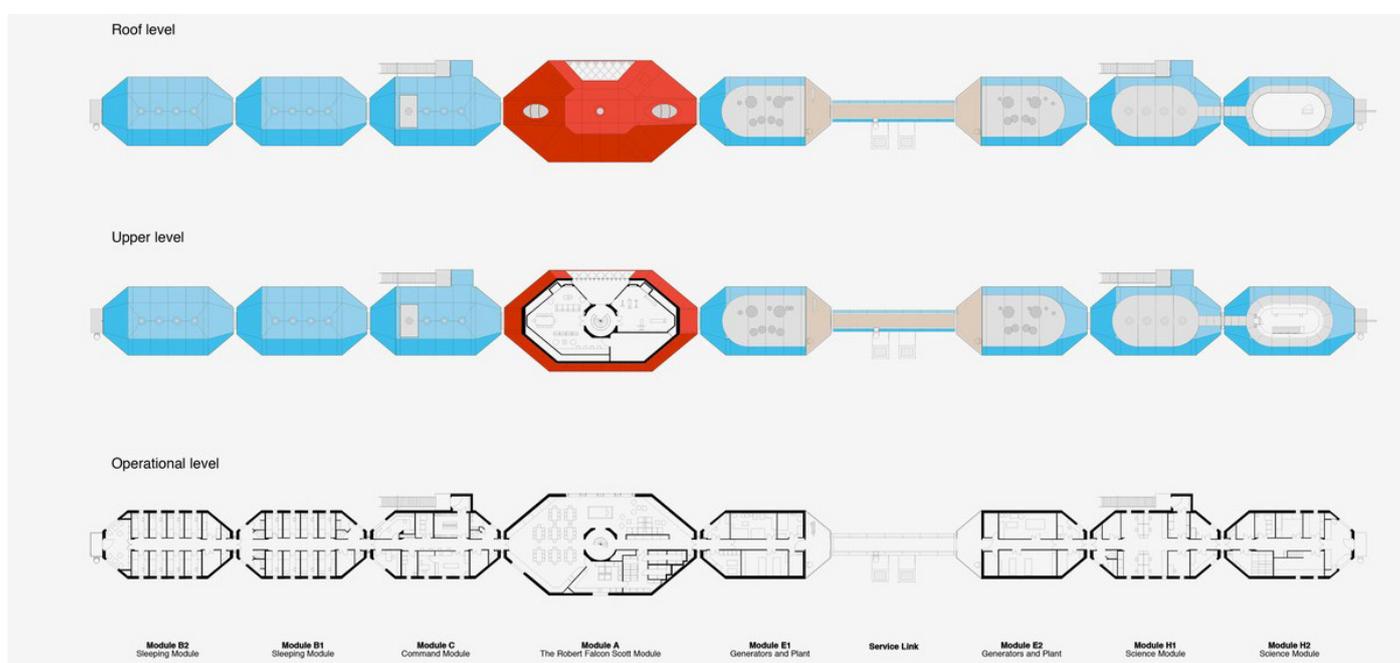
Halley VI Plan. Photo attributed to Ruth Slavid. Source: Ice Station the creation of Halley VI Britain's Pioneering Antarctic Research Station
